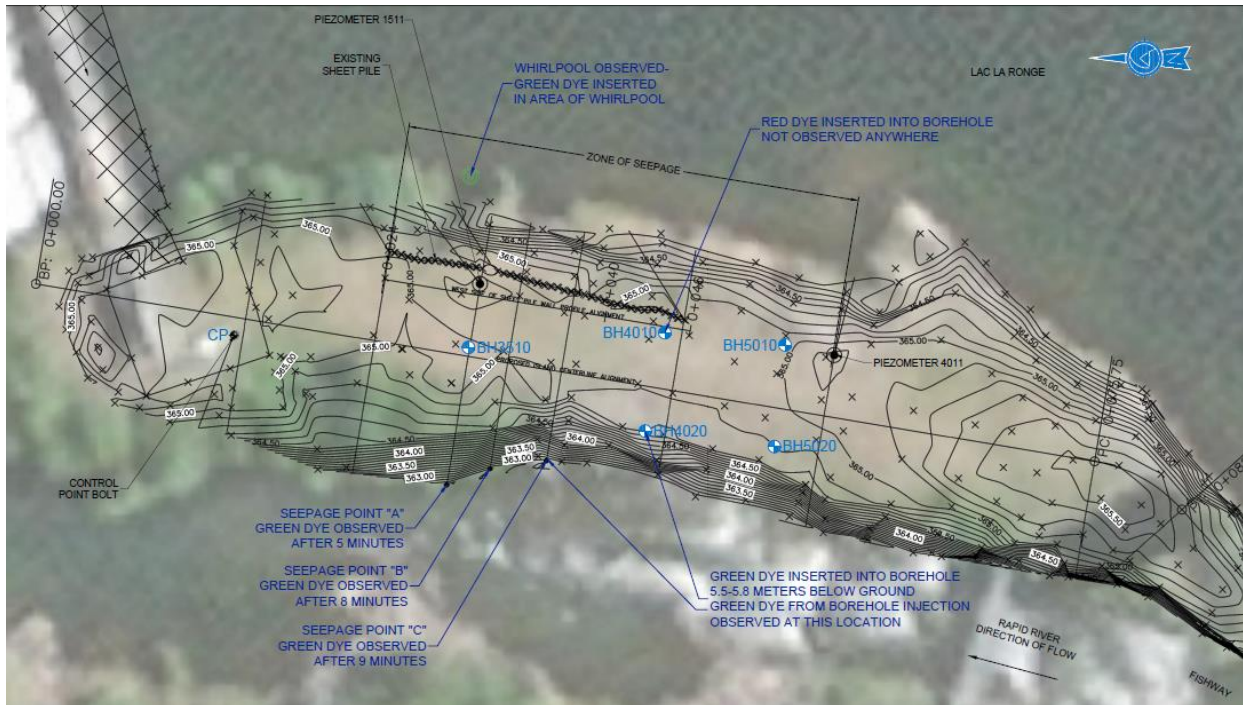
Plan view of Lac La Ronge Dam Embankment with Borehole Location
